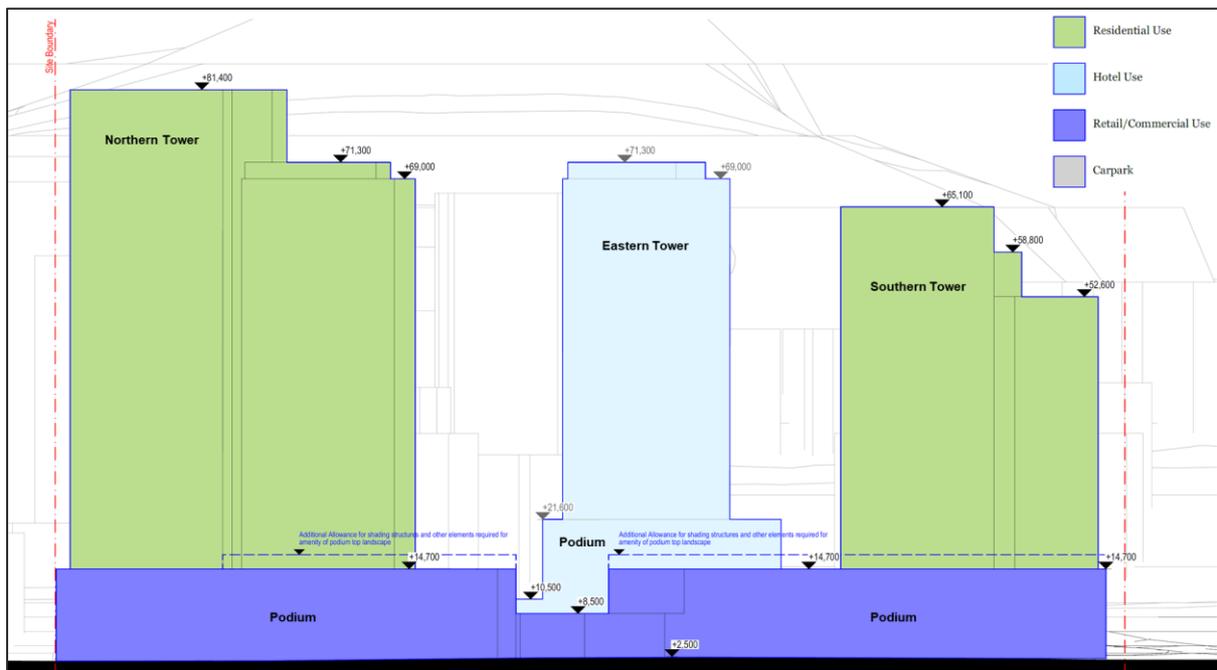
| Baker Street elevation of the Concept Proposal building envelope (Base source: Applicant's RtS)
